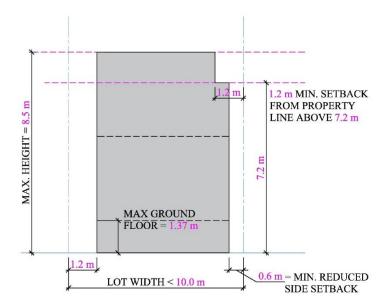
K.F5: Flat Roof Building with Side Yard Setback Less Than 1.2 Metres
